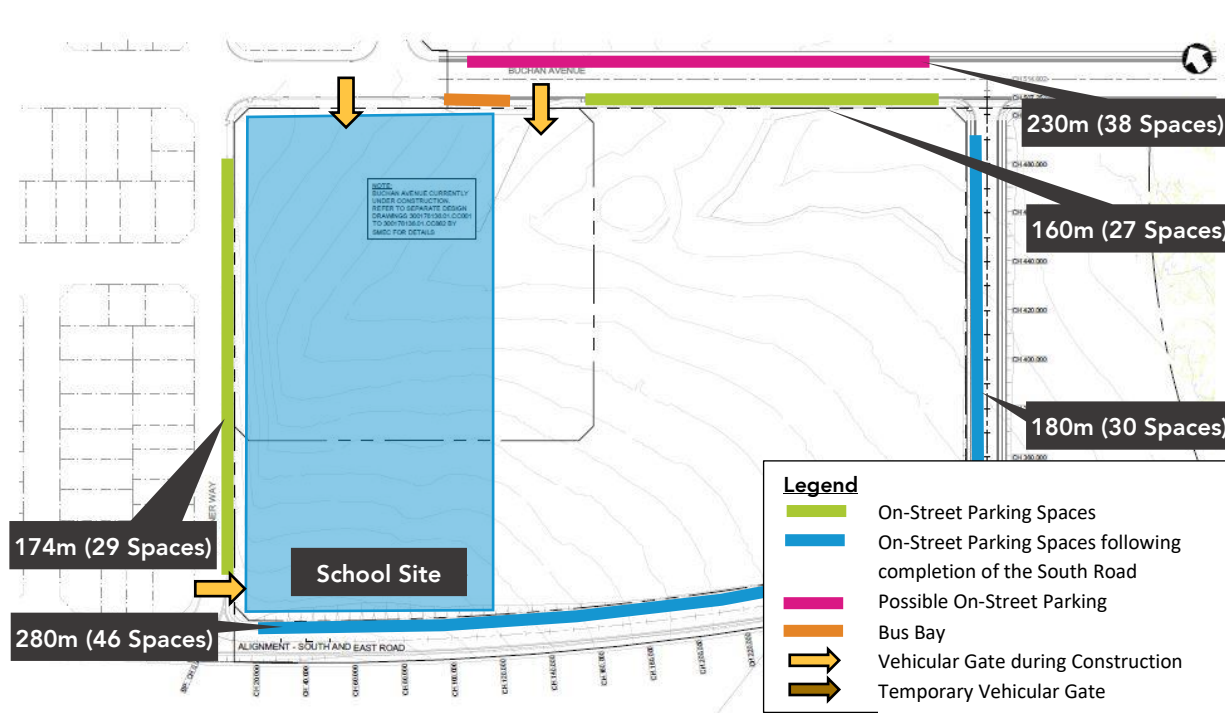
On-Street Parking Spaces on the vicinity of the Site
